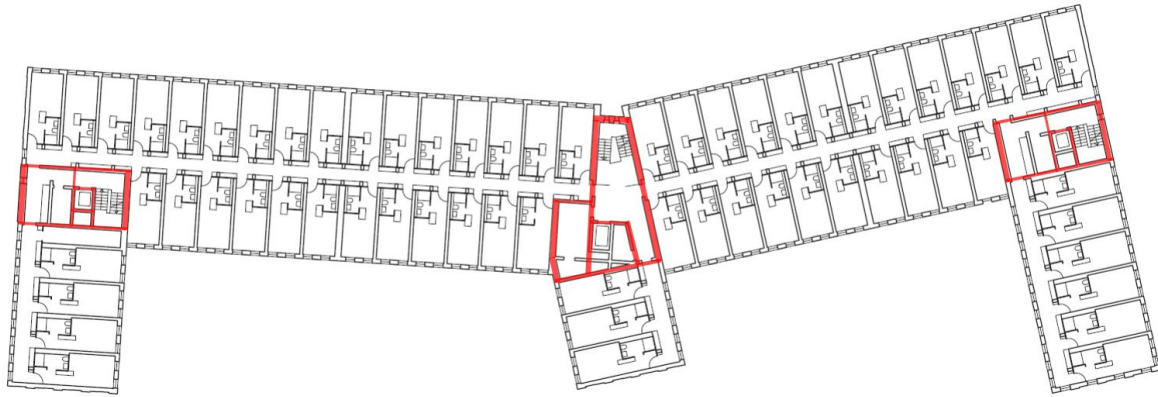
Woodie Student Hostel: Floorplan of standard floor (Huß et al. 2019)
